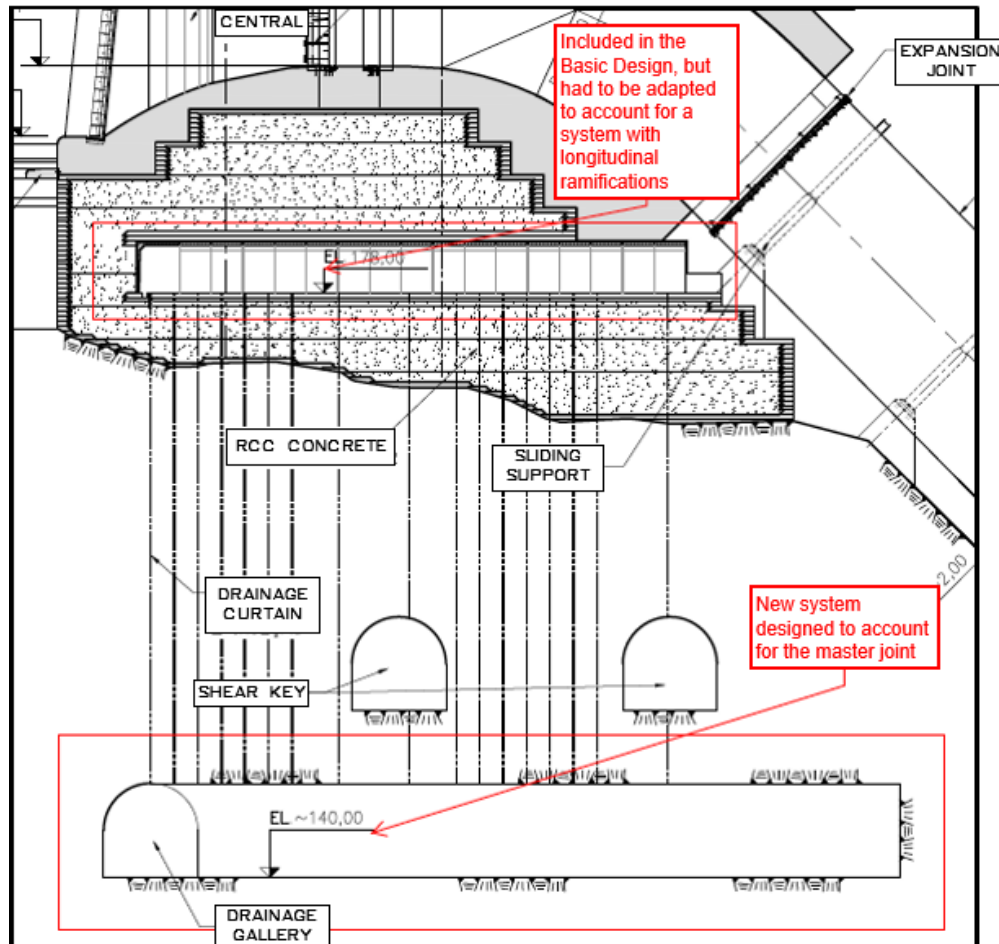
Detail of the cross section of Water intake structure foundation showing the shear keys, drainage galleries and drainage curtain
